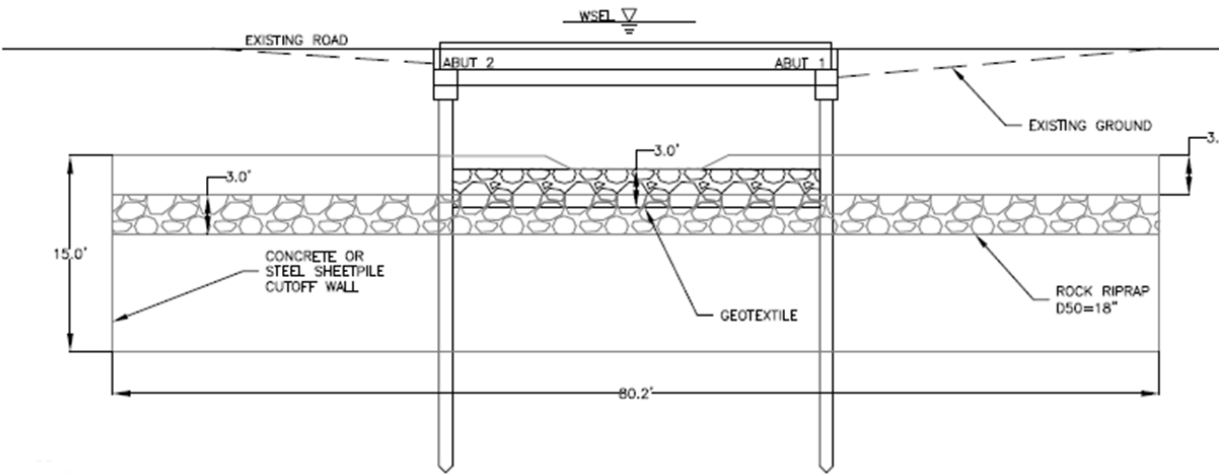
Cross-sectional view of Bridge A-27-N with recommended hydraulic scour countermeasures
